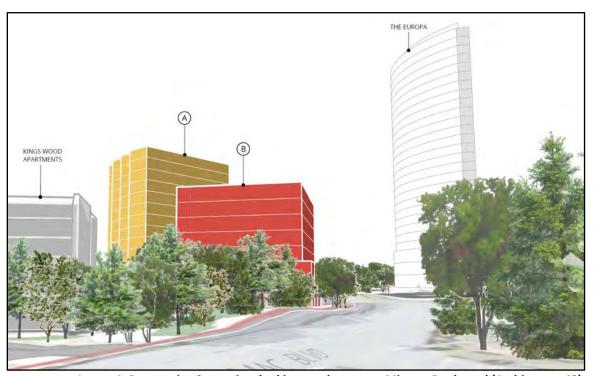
Perspective Streetview looking south-west on Micmac Boulevard (Architecture49)
